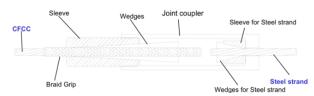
CFCC-Steel coupler setup (Tokyo Rope)
